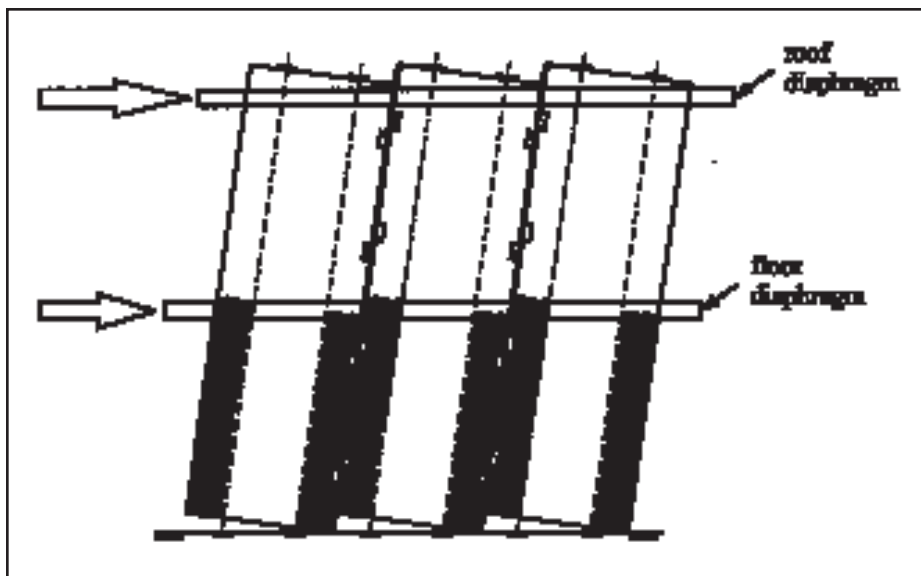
Lateral load deflected shape of a precast wall with vertical joint connectors.
